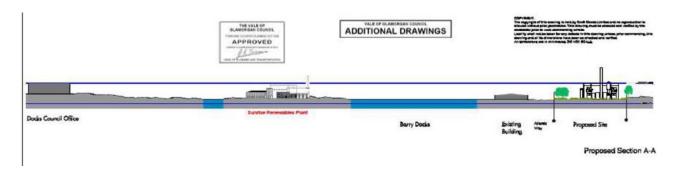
2015 Application Elevation within Approved Atlantic Way Power Plant Cross Section Plan. 2015 Application Site is to the centre left of the section, Atlantic Way Power Plant to the far right.
